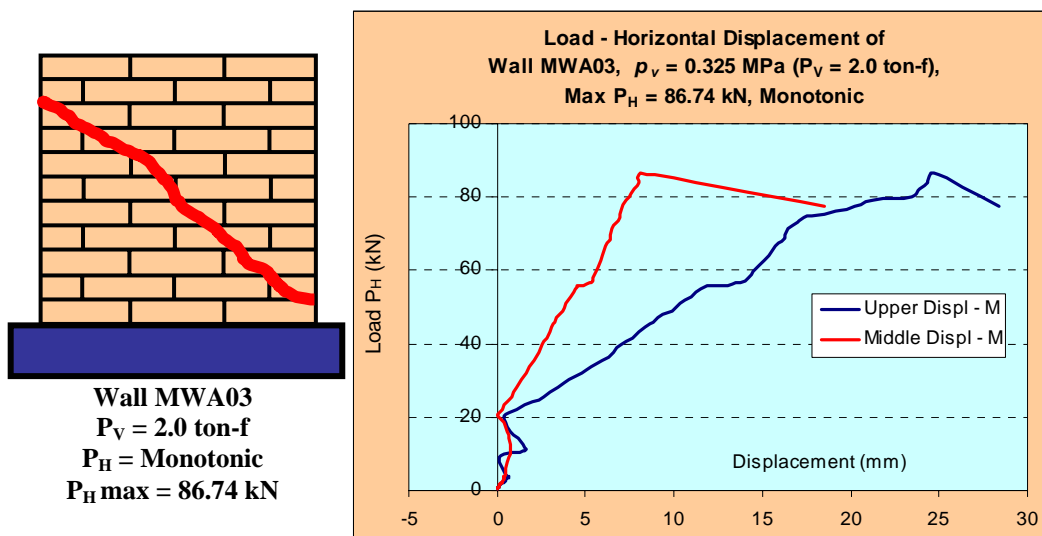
Failure pattern and load-displacement of wall MWA03
